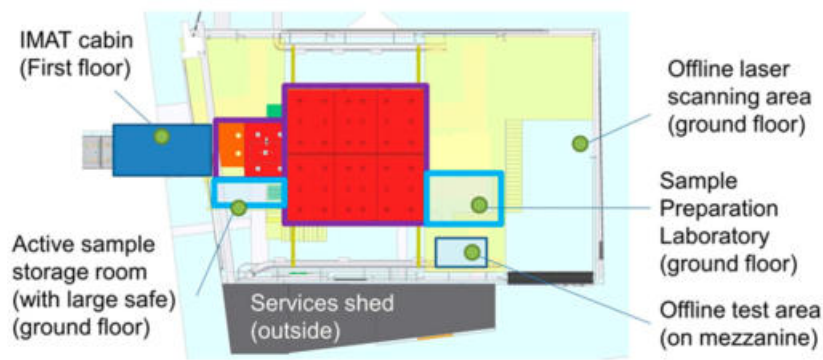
Plan-view sketch of the IMAT extension building, showing the infrastructure around the IMAT blockhouse.
